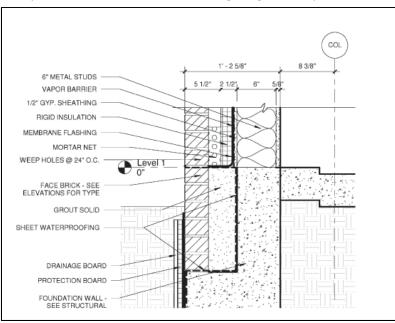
Detail of exterior masonry wall at foundation. Image courtesy of Ellerbe Becket.
